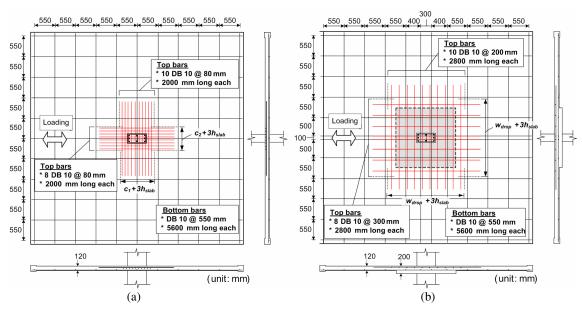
Bonded reinforcing bars in slabs: (a) specimen without drop panel, (b) specimen with drop panel
